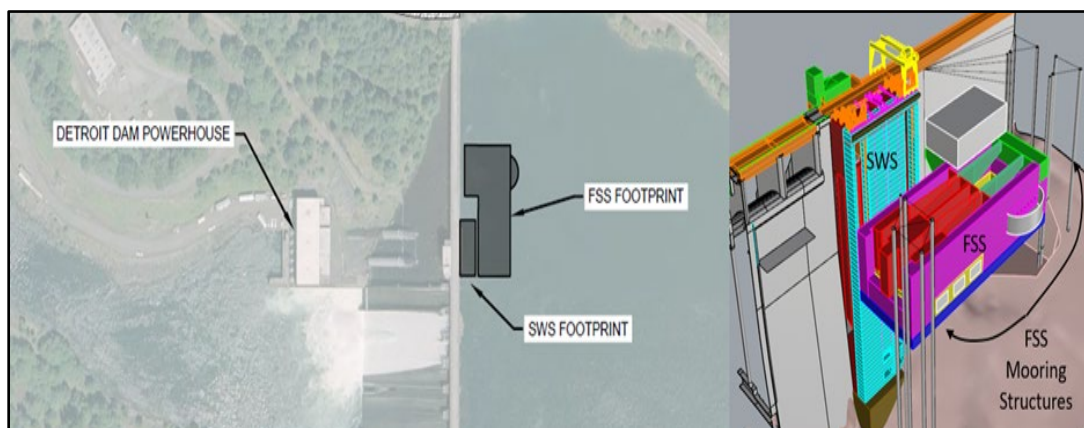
Proposed Detroit Water Control Tower with Attached Floating Screen Structure.
